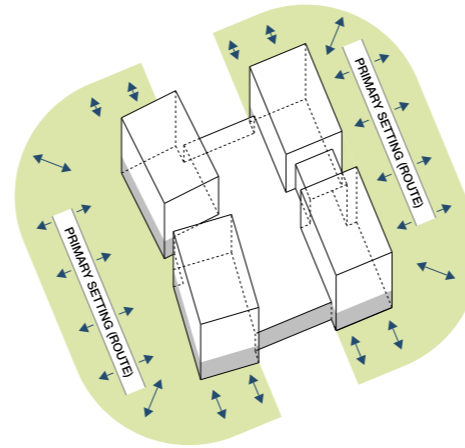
Building E - Relationship between buildings and external, public settings.
